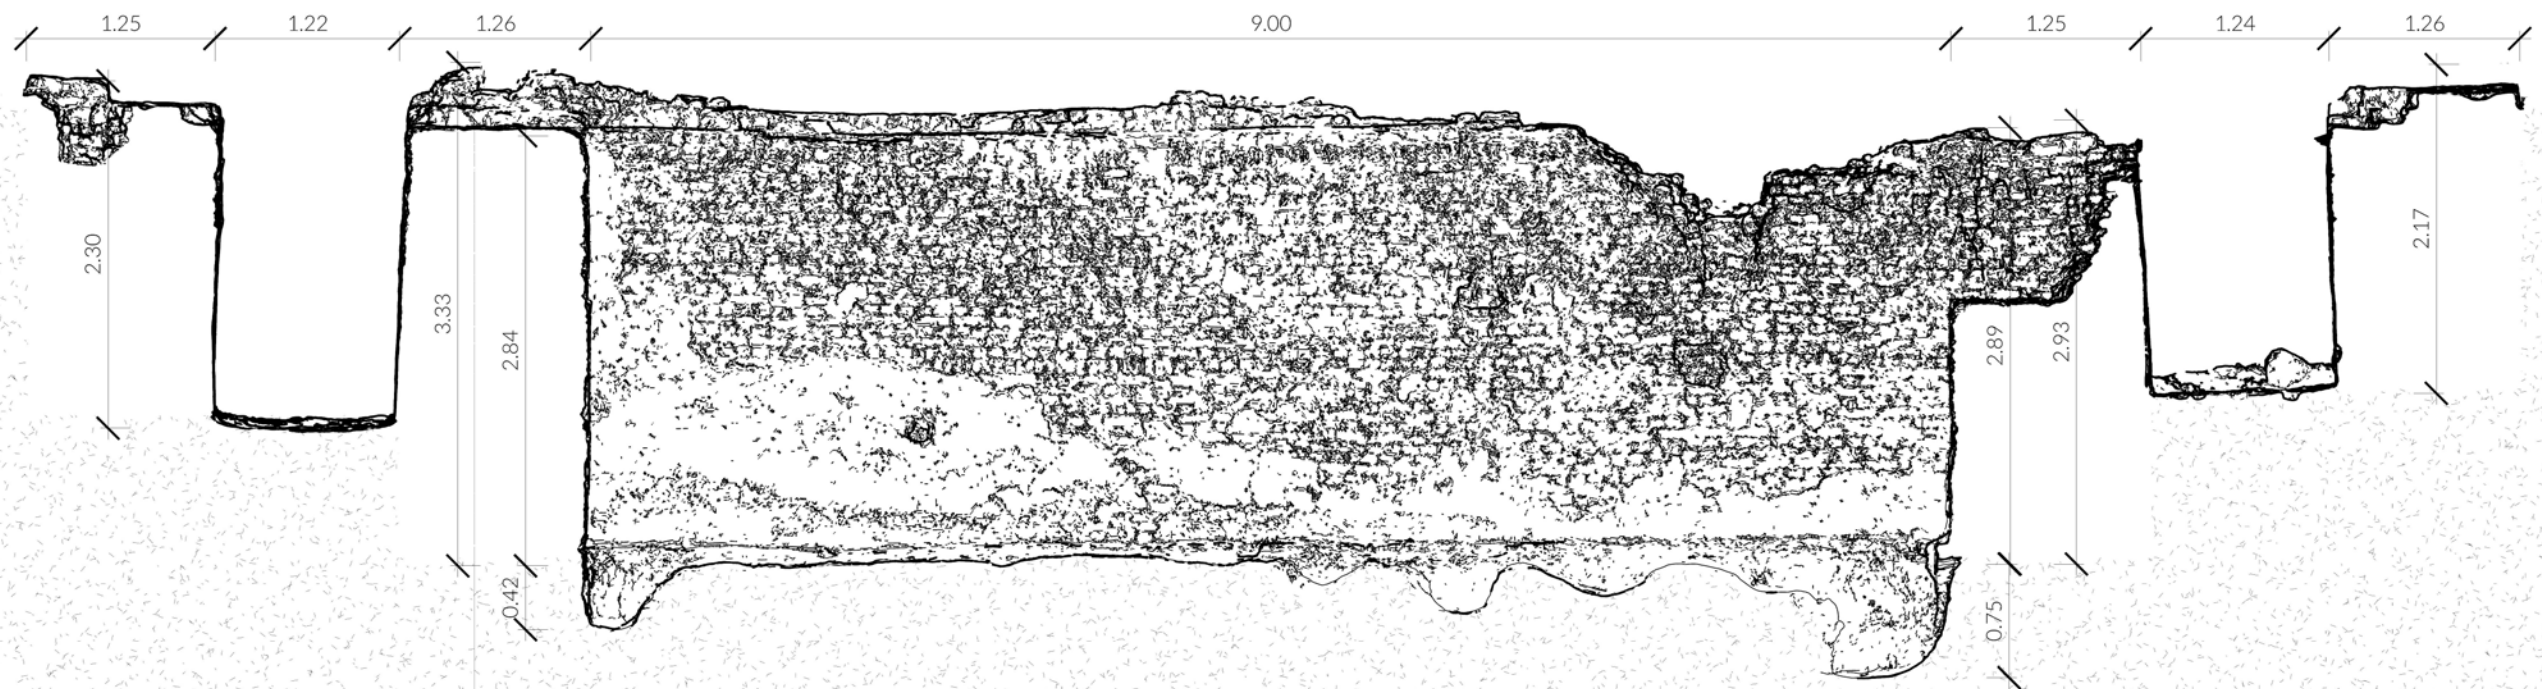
Section through YKK2 - YKK - YKK5, north wall, 1:50
